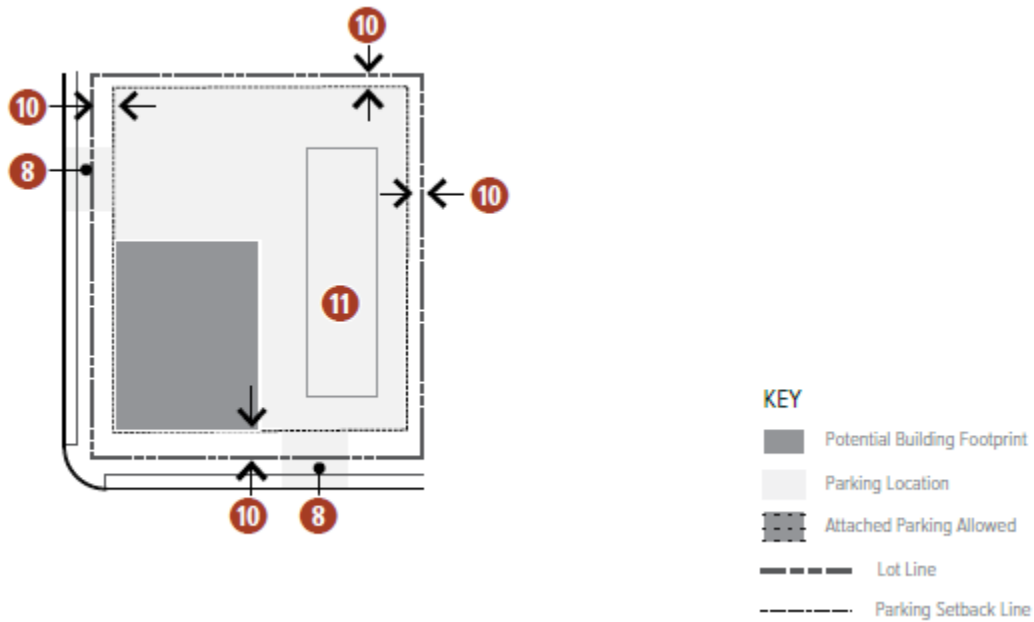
Workshop-Warehouse Building Siting
